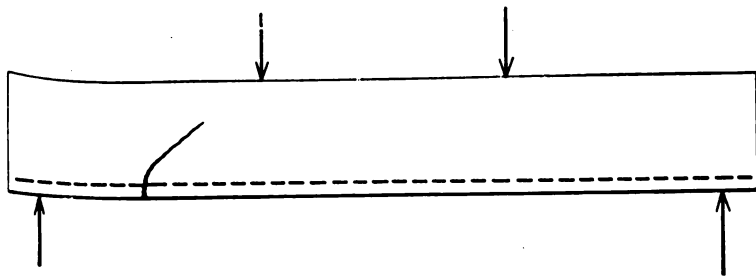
Beam Failure by Diagonal Tension.
